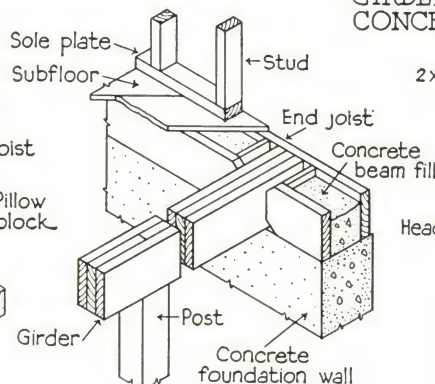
BUILT-UP GIRDER END SET ON CONCRETE WALL
